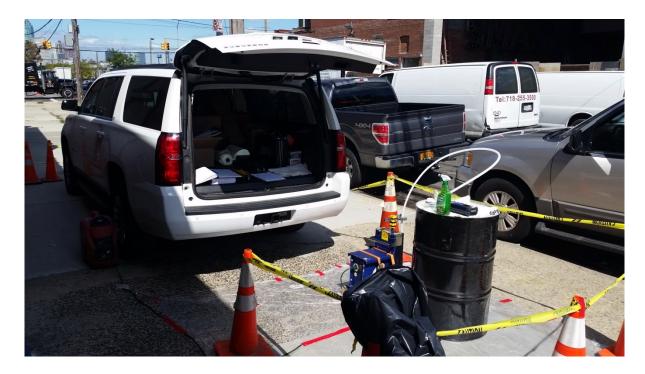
9/14/15: Site Setup for DNAPL removal at 315 Kingsland Ave
